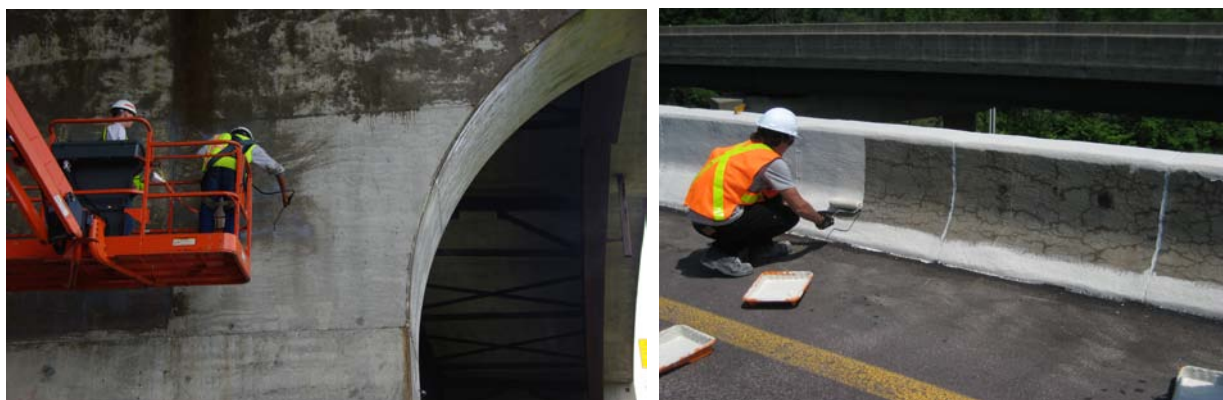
Application of 40 percent water-based silane to bridge column in Maine (left) and elastomeric coating to bridge barrier wall in Vermont (right).
